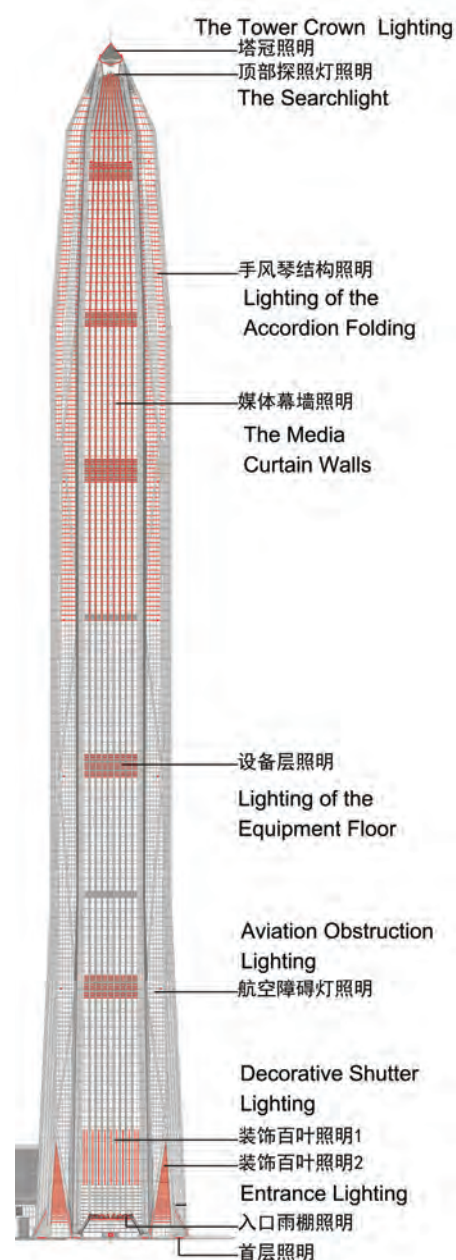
Façade lighting layout (Source: Beijing Fortune Lighting System Engineering Co., Ltd.)
